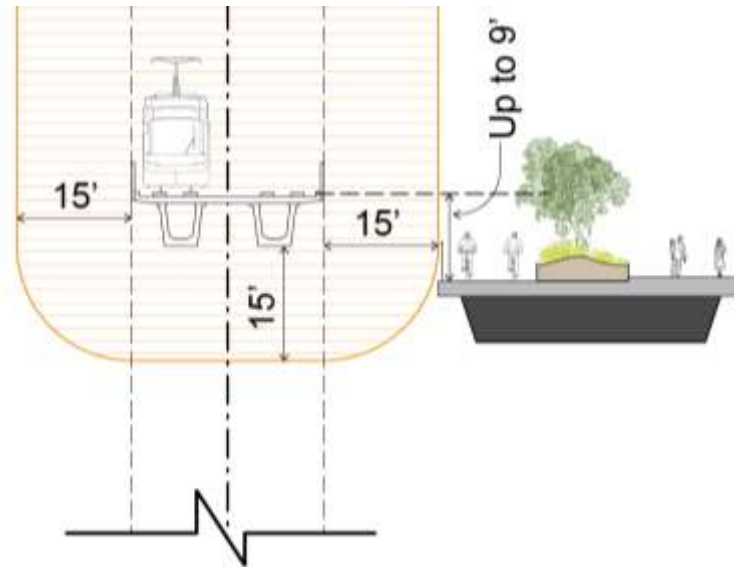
Section showing potential bridge location and required guideway setbacks east of I-405.
